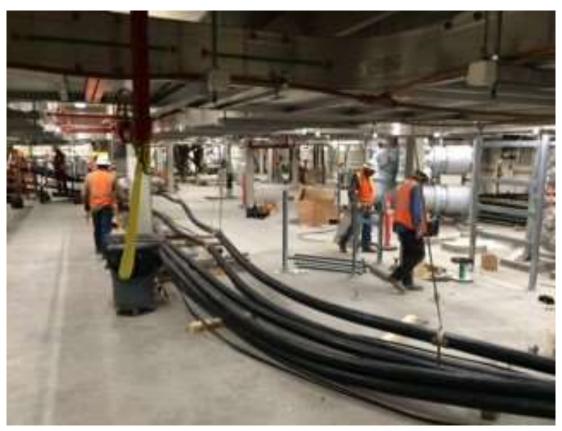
CCE installing infrastructure and electrical work in GIS building in the Potrero Switchyard, July 18, 2016.
